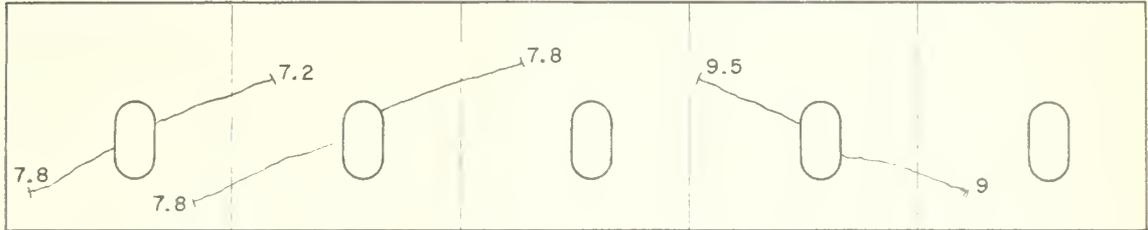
CRACK PATTERN IN BEAM NO. 6
